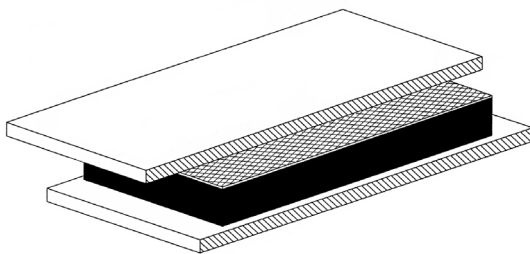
Cross-section of a free sliding bearing (WABO ELASTODEC EM)
